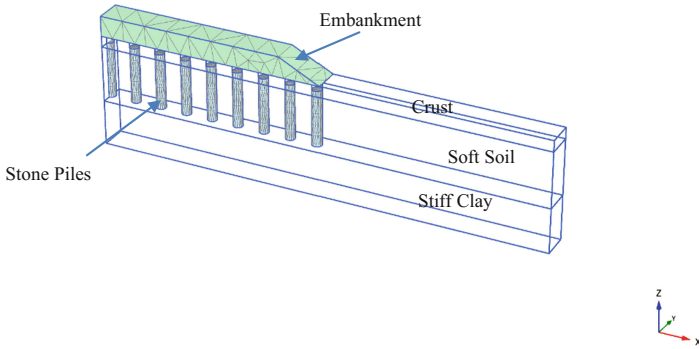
Full 3D model of the embankment constructed on stone piles reinforced soft soil
